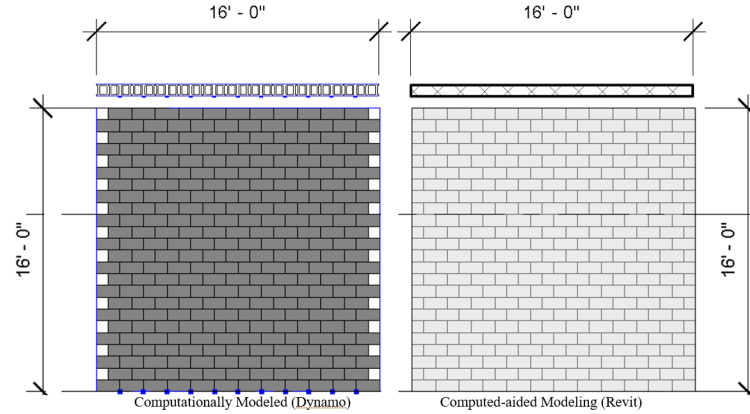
Increasing the LOD of a Wall constructed out of $8'' \times 8'' \times 16''$ CMUs in both plan and elevation view.
